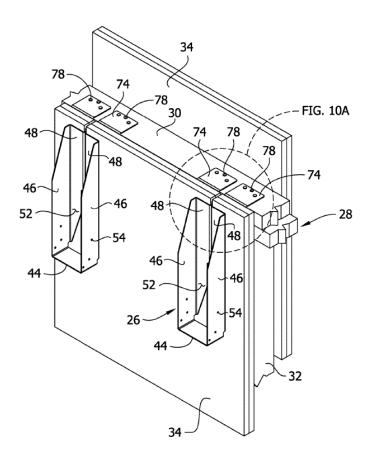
is a perspective view of wall 28 having fire retardant sheathing 34 with a slot cut in the sheathing to receive truss hanger 26.
